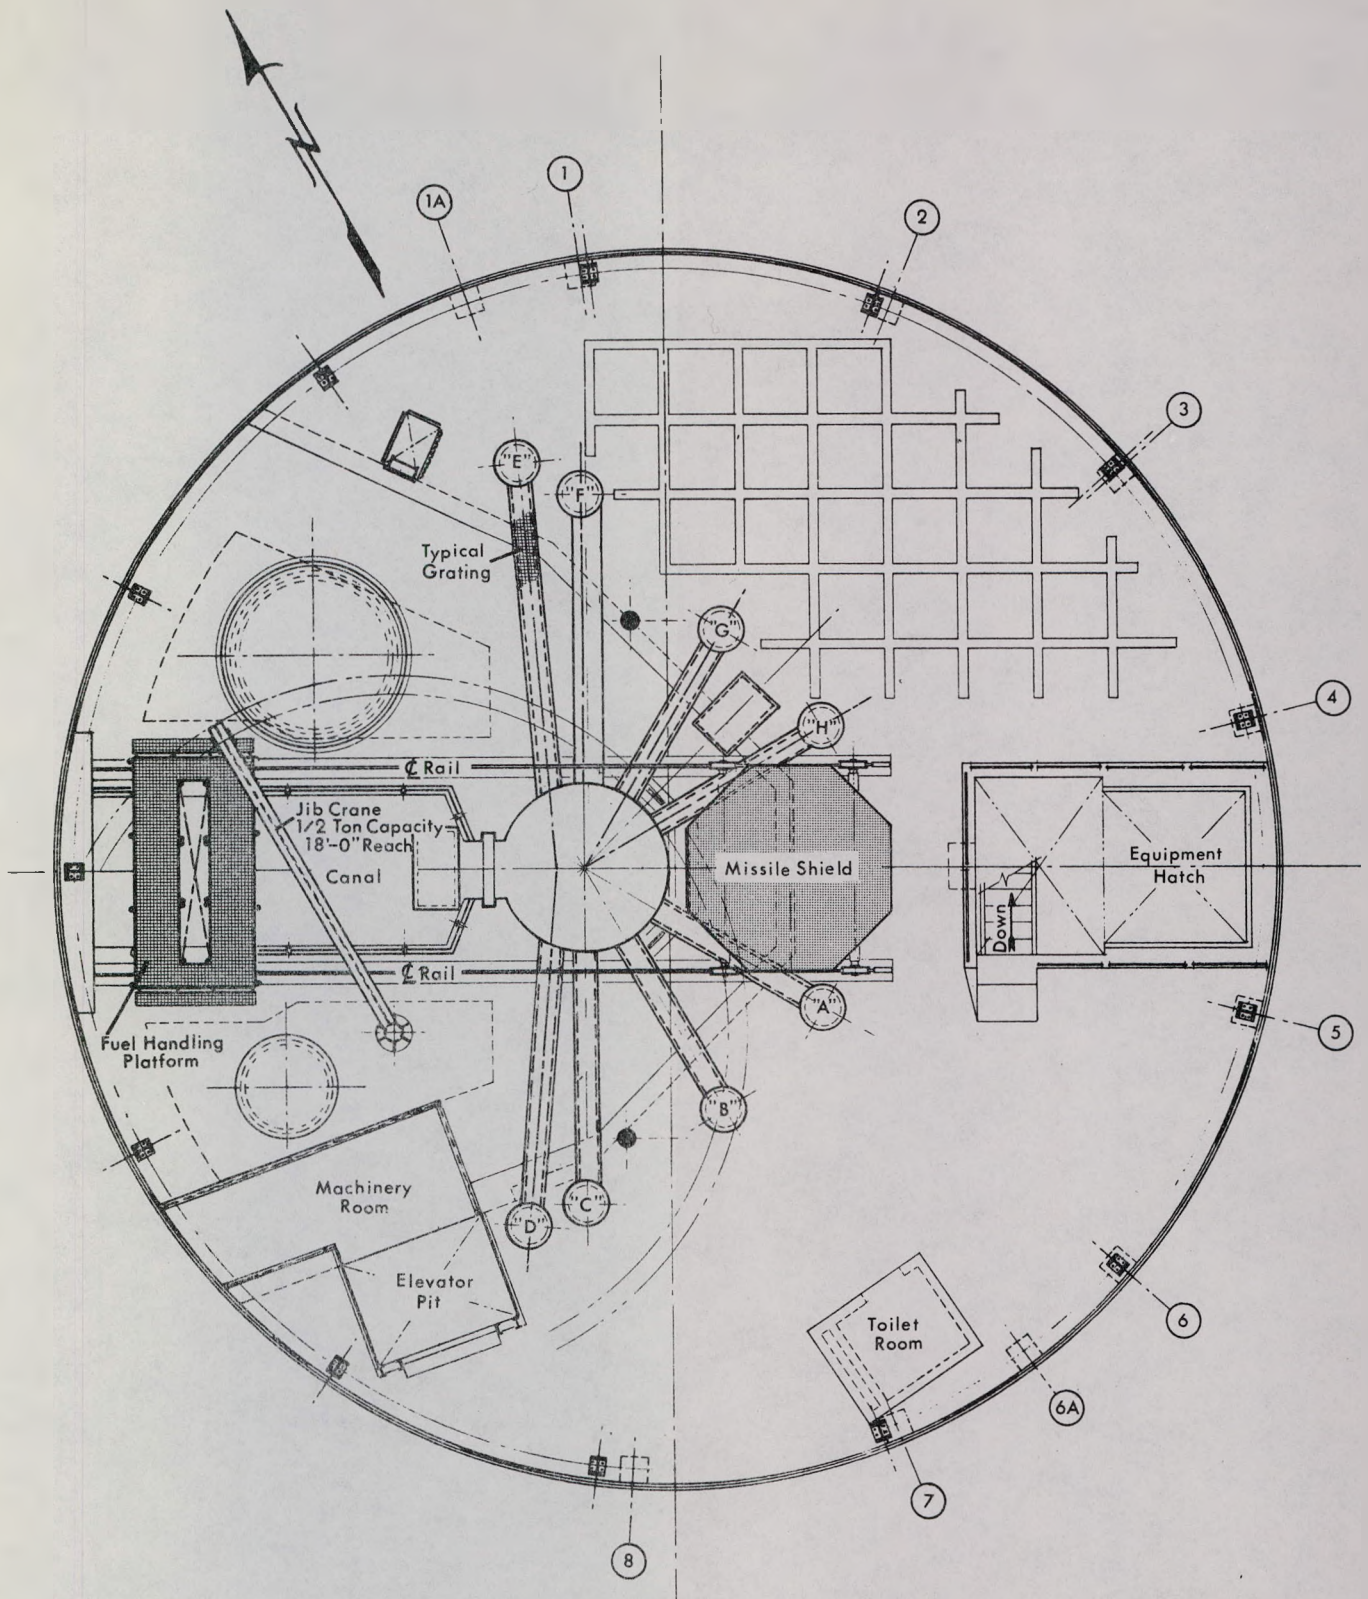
REACTOR BUILDING THIRD FLOOR PLAN
